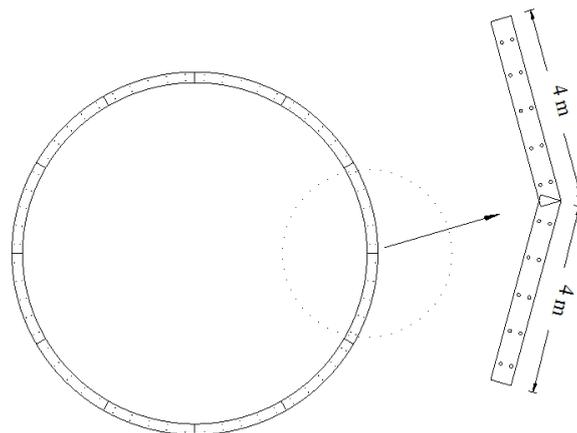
Horizontal cross section of diaphragm wall with embedded grouting pipes
